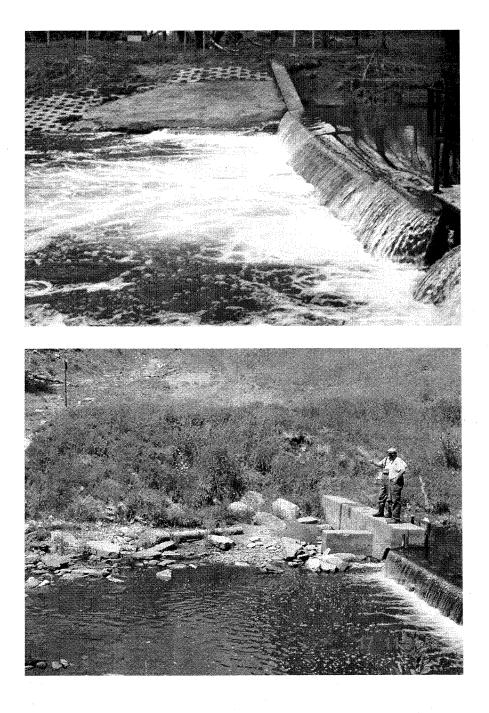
Different abutment and armoring designs used at sea lamprey barriers. Top. An angled, sheet metal abutment is shown on the far side of Duffin's Creek, ON. Bottom. A vertical, concrete abutment is shown on the far side of Day's River, MI.
